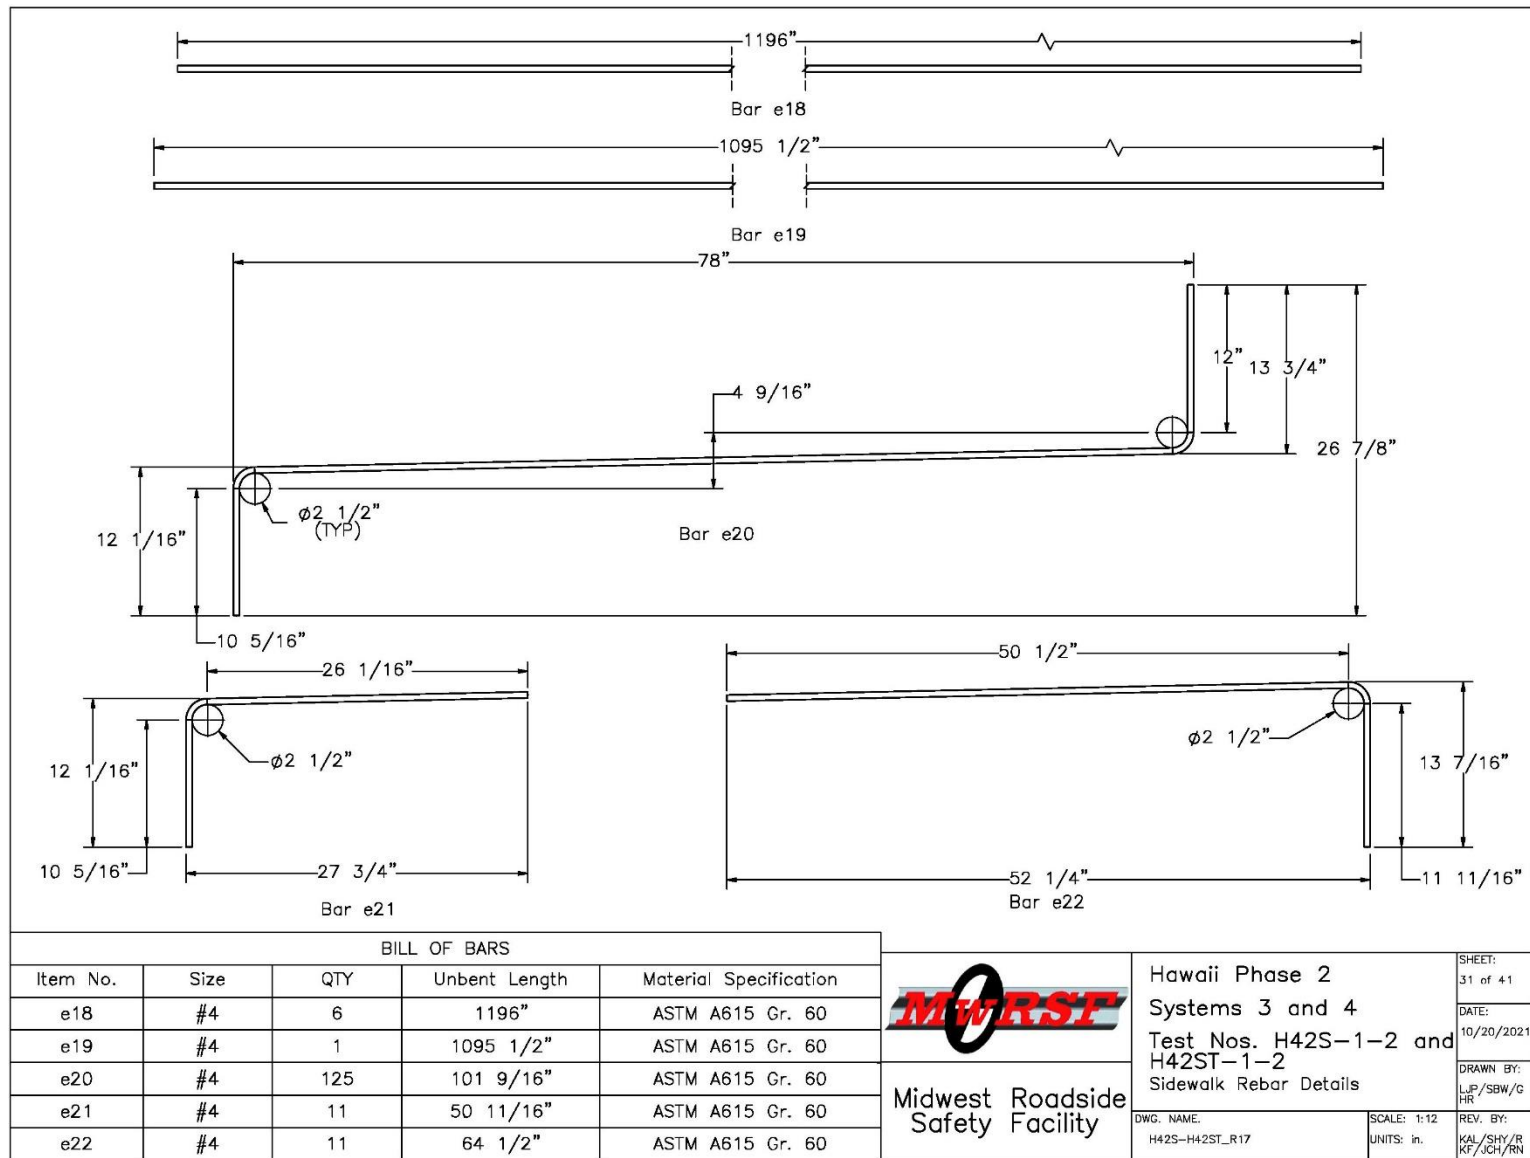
Sidewalk Rebar Details, Test Nos. H42S-1 and H42S-2
